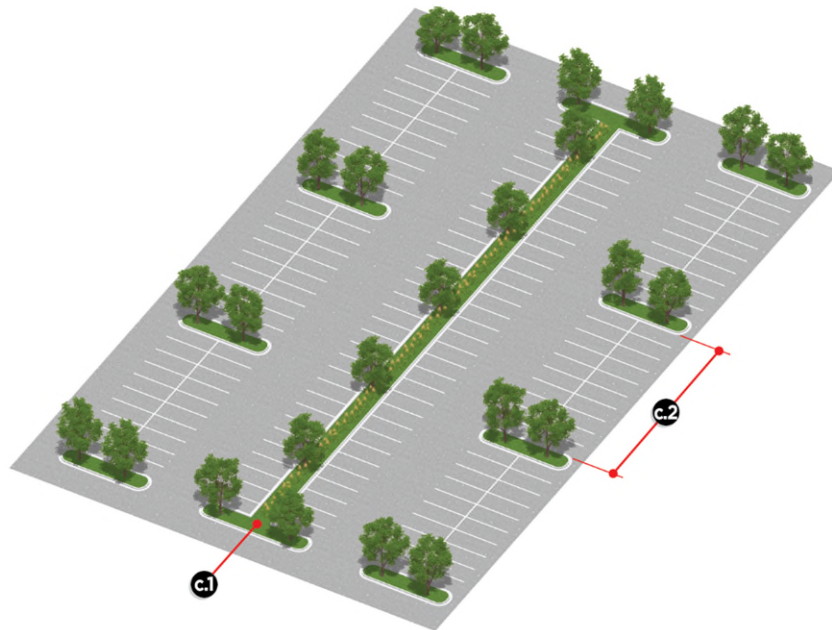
Parking Lot Perimeter Area Landscape Standards
